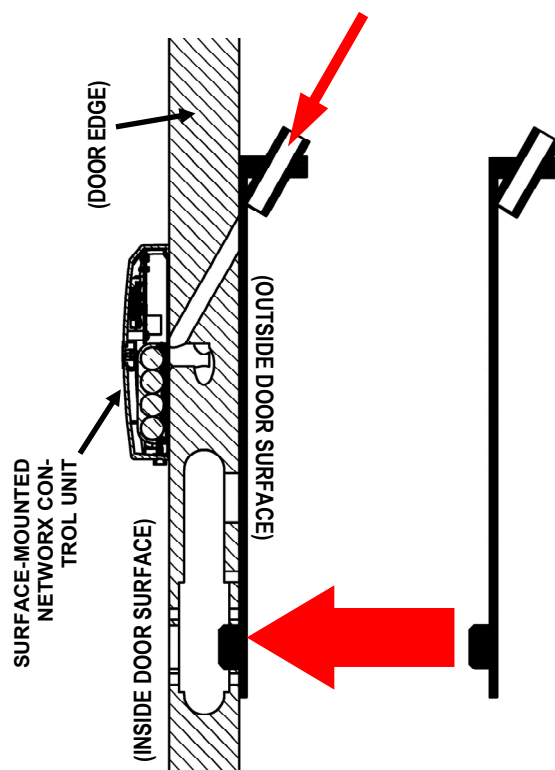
D: SIDE VIEW SHOWS HOLE PATHWAY. JIG IS INSERTED INTO THE OUTSIDE ("UNPROTECTED" SIDE) OF THE DOOR.
